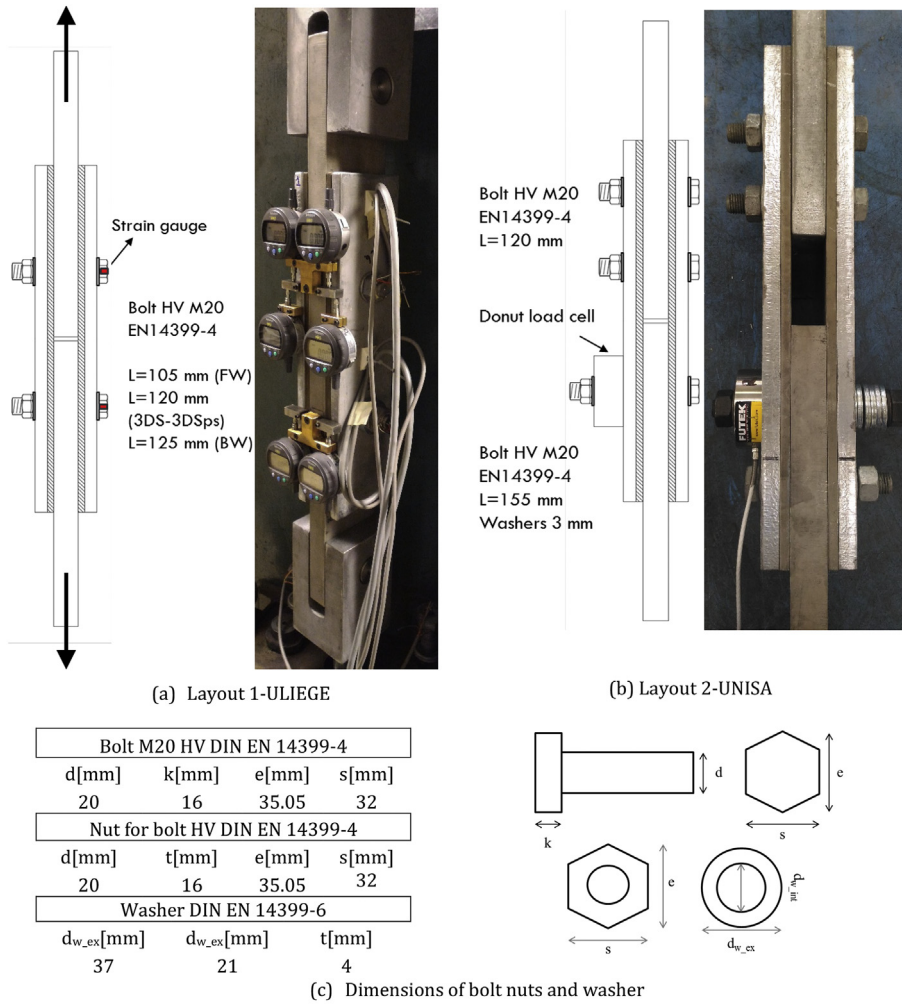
Test layout in (a) Liège with bolt length for each washer configuration presented in the following and (b) Salerno; (c) bolt, nut and washer dimensions.
